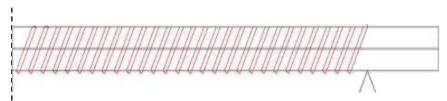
Dowel arrangement in the two-layer beam (one half beam)
